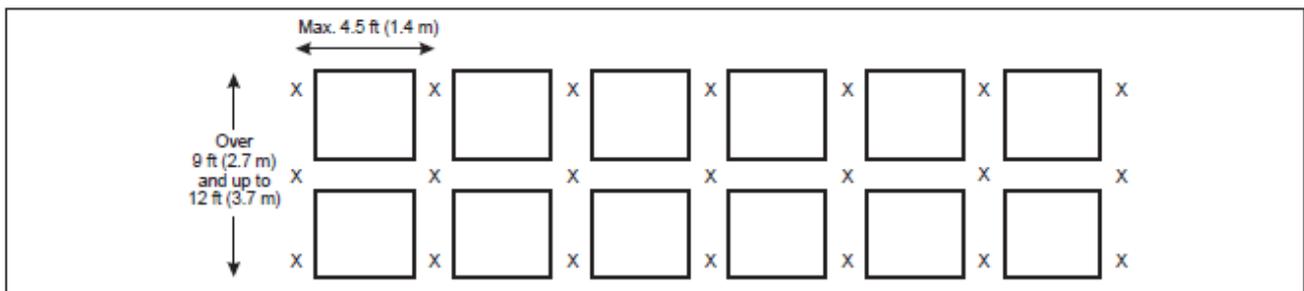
Plan view of alternative in-rack sprinkler arrangement for double-row racks up to 12 ft (3.7 m) deep
